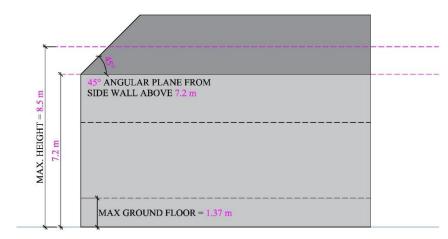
K.F8: Perpendicular Massing on Pitched Roof Building with No Front Porch
